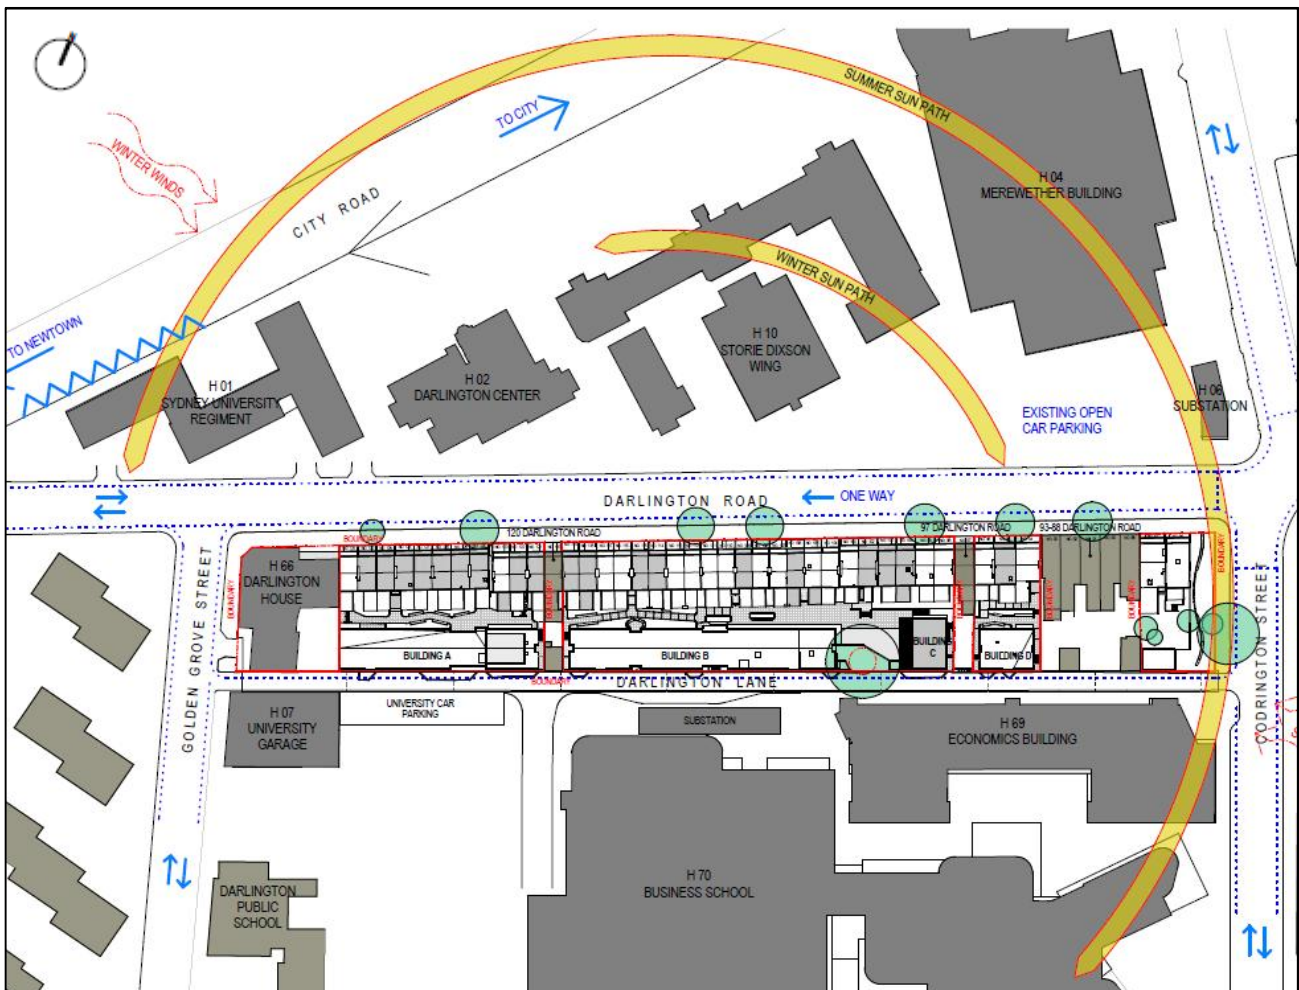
Building orientation and solar path (AJ&C Development Application Drawings 2016)
